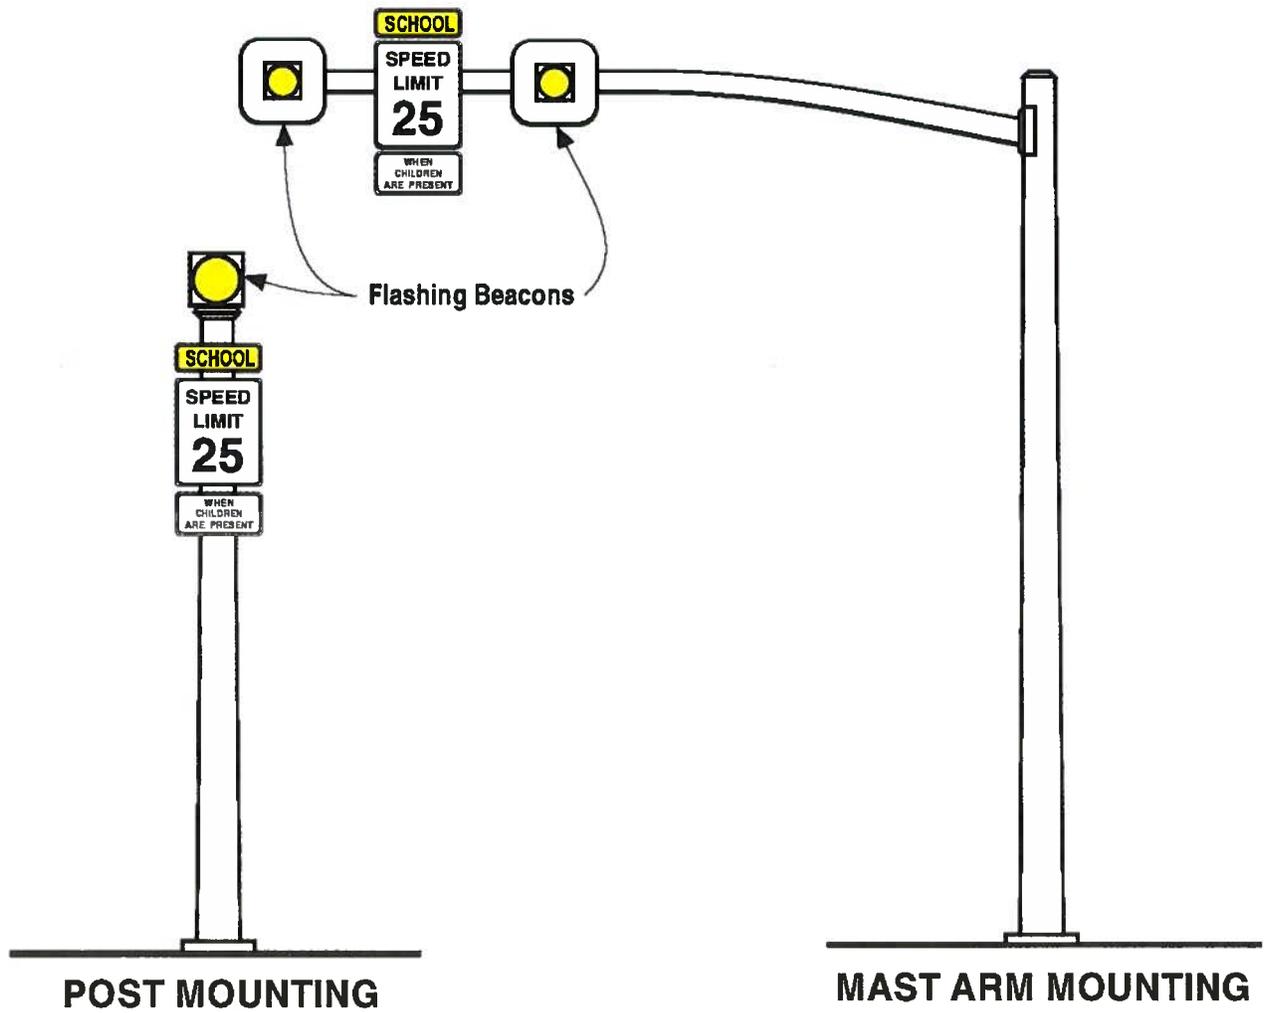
TYPICAL INSTALLATIONS FOR FLASHING YELLOW BEACONS AND OVERHEAD SCHOOL SIGNS
